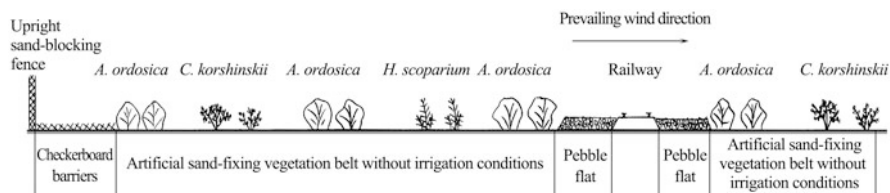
Cross-section of the integrated system controlling aeolian disasters along the railway in Shapotou (provided by Wang 2011)
